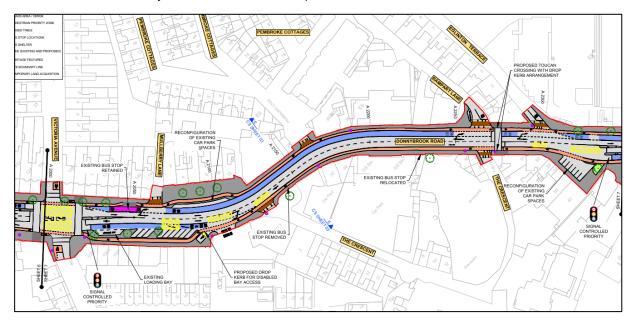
Extract from General Drawing Arrangement at Donnybrook Road (Sheet 07)
